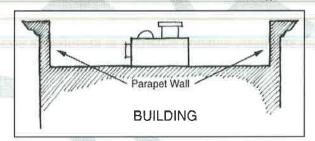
Example of how parapet walls are utilized to screen roof mounted mechanical equipment.
